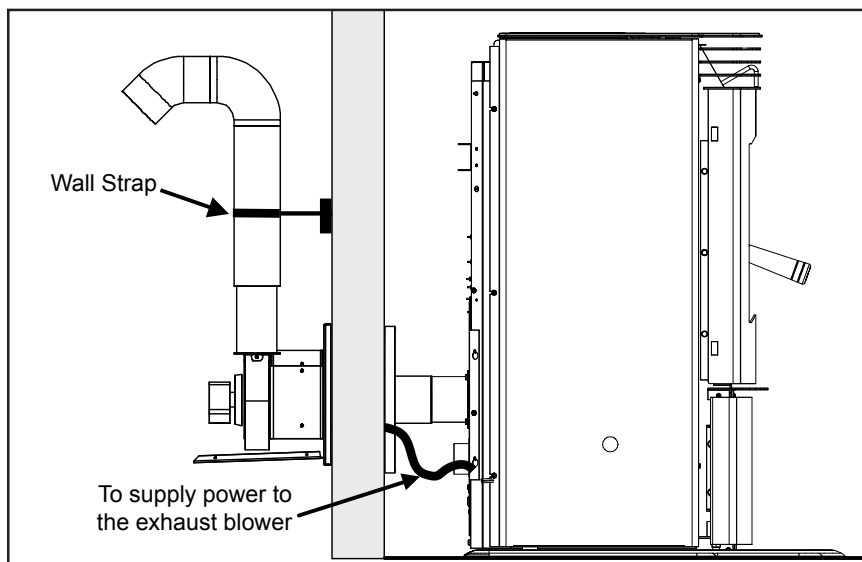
Through Wall Installation with Exterior Blower Kit; Side View.
